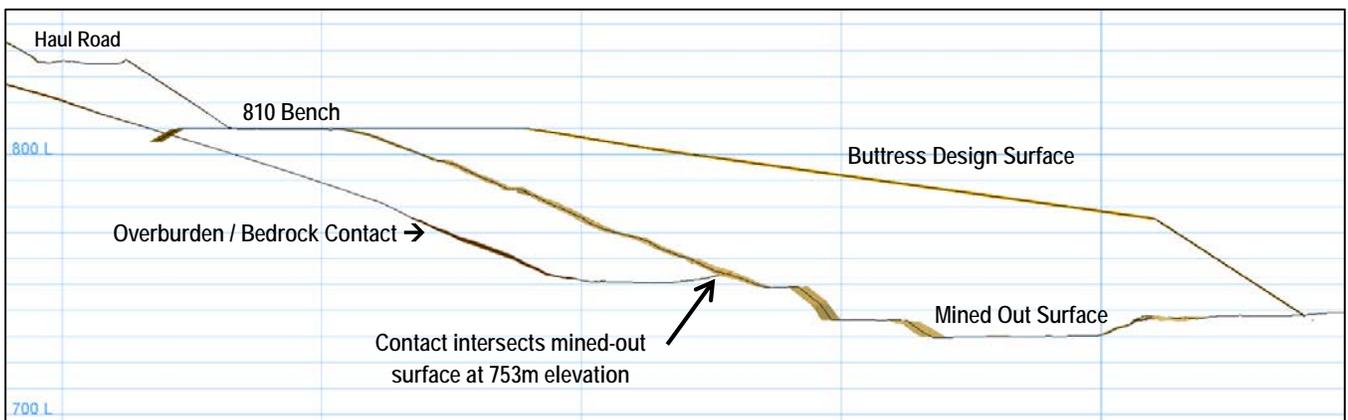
Section (0° azimuth) through centerline of buttress, looking west.
